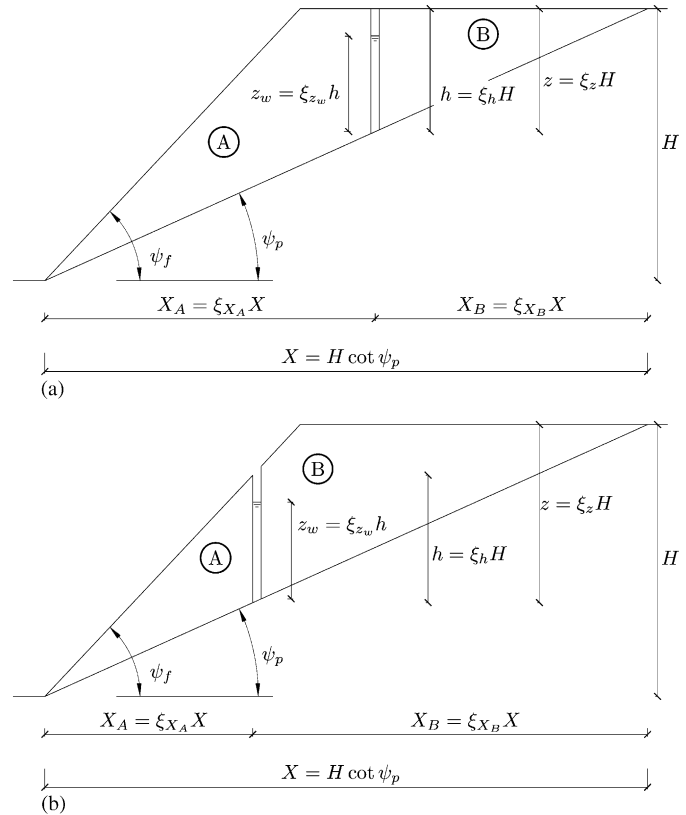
Geometrical definitions of the considered slope stability model: (a) Tension crack at slope top; (b) tension crack at slope face.
